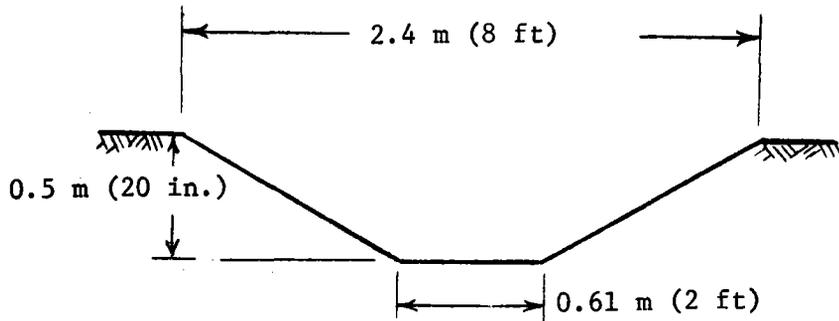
B, DRAINAGE TRENCH, (TYPICAL)
